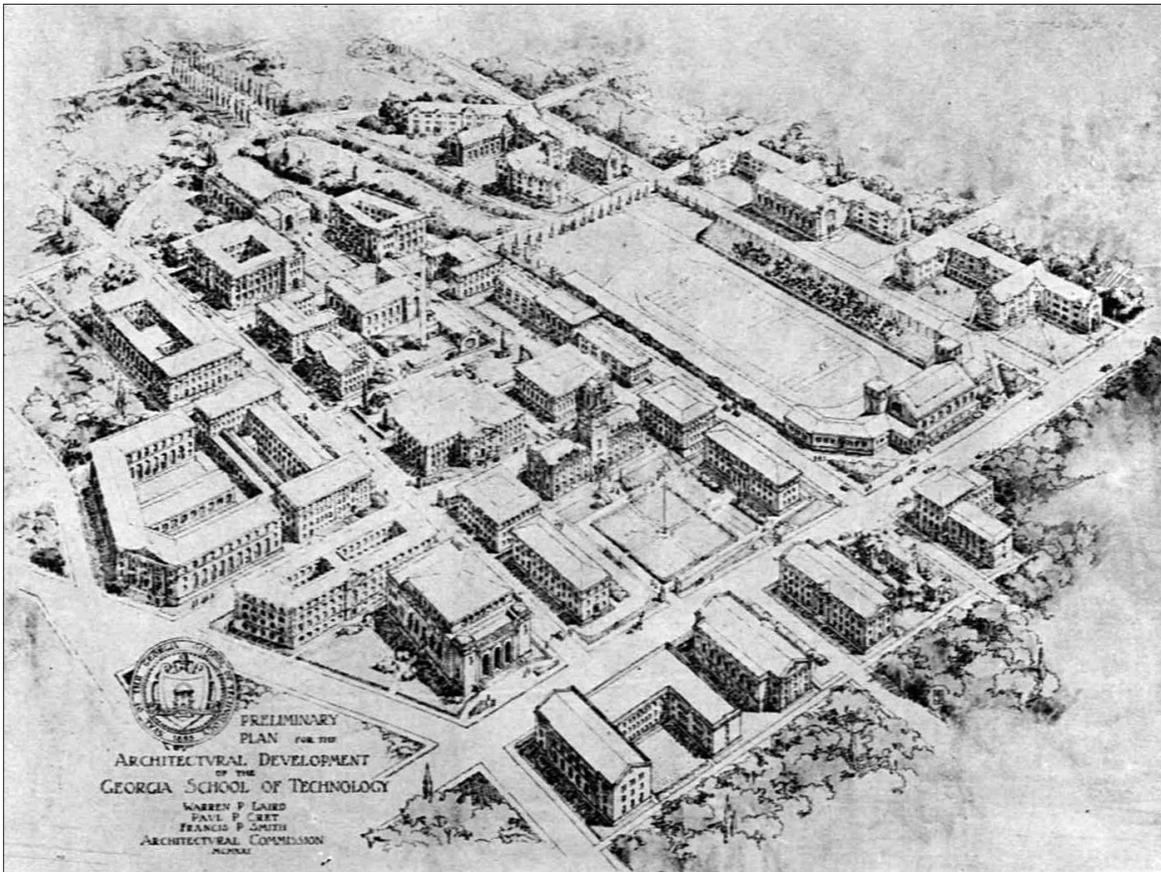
“Greater Tech Plan” c.1921 preliminary plan by Warren Laird, Paul Cret and Francis P. Smith. This plan was promoted with the Greater Georgia Tech Campaign, a fundraising campaign begun under President Matheson for building programs at the college. The Plan above proposes a number of new buildings including those for Chemistry, Physics, Architecture, Ceramics, Armory, Auditorium, Gymnasium, Student and Faculty Dormitories as well as “improvement” to numerous existing campus buildings primarily to bring them into line with the architectural vision of the creators which included promoting the use of Collegiate Gothic as the architectural style of choice.
